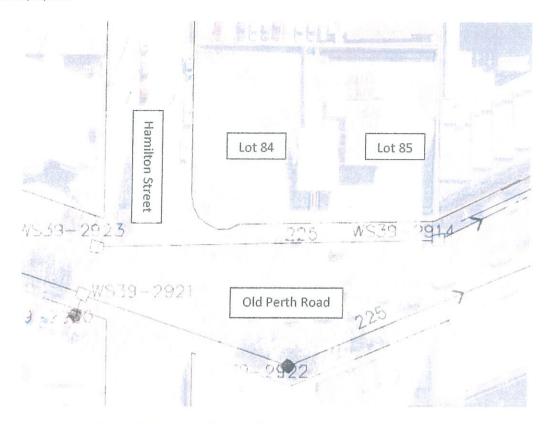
Site Aerial and Town of Bassendean stormwater drainage overlay
